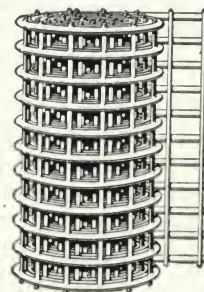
Electrically Welded Wire Fabric Reinforcement
